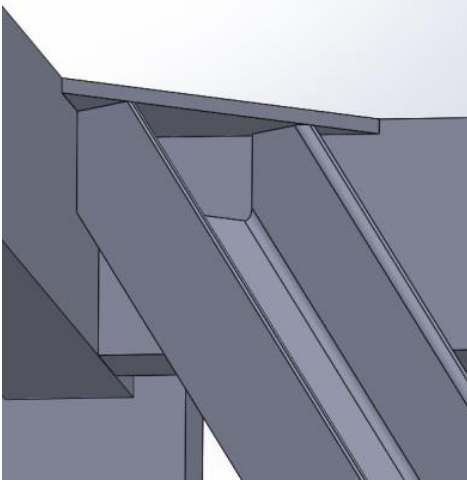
Upper Weld Joint (3D CAD Model)
